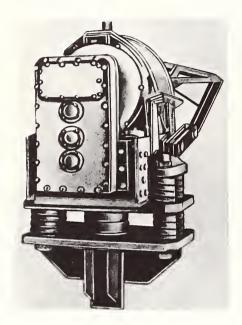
General view of hammer drill designed by VNII for Footings and Foundations (M. G. Efremov).
